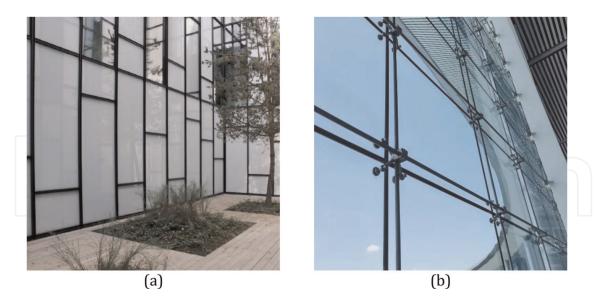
Examples of glass façade; (a) framed glass façade, and (b) frameless glass façade.
